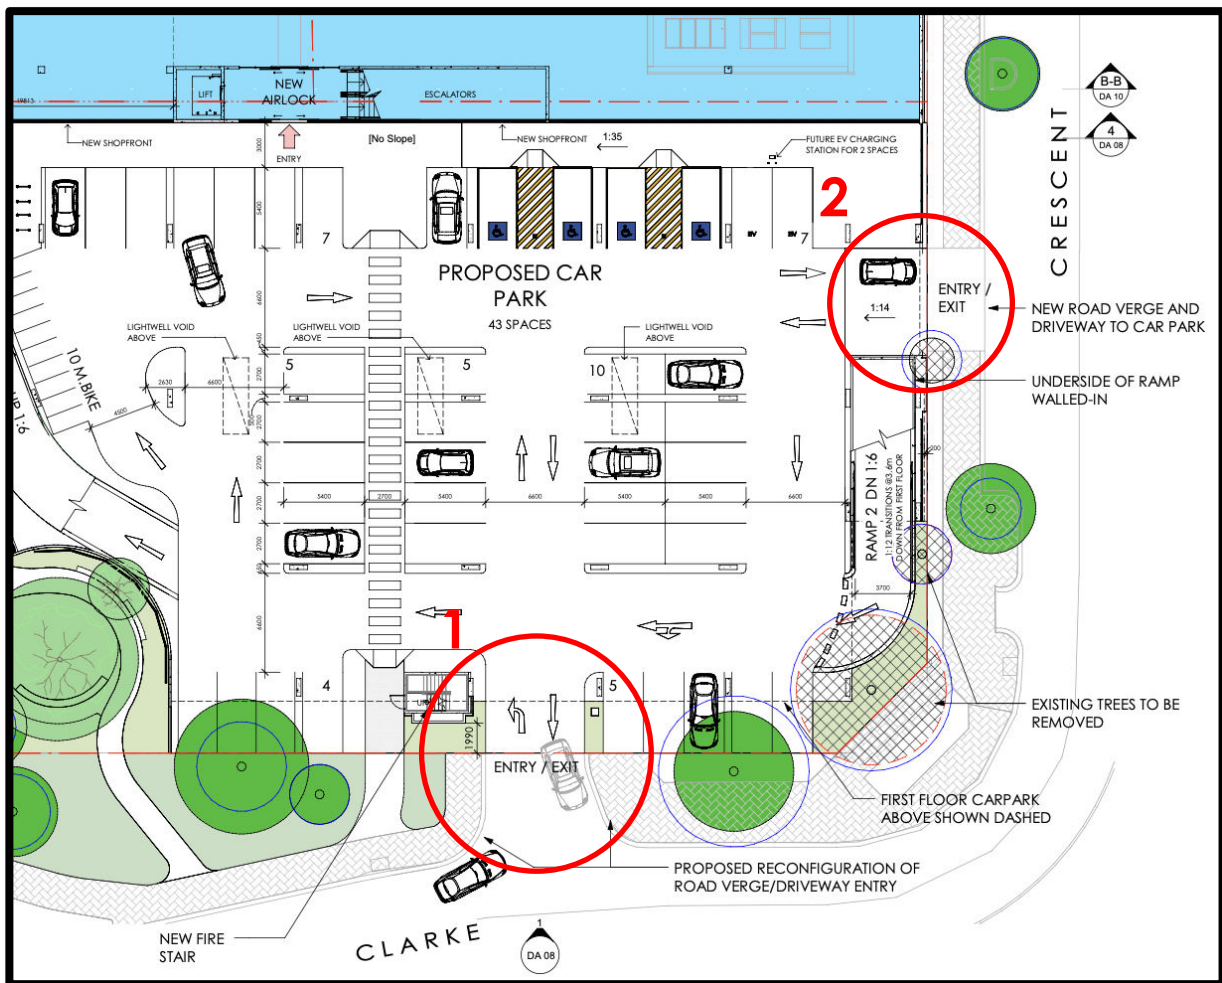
Proposed Parking Lot Crossover Reconfigurations
